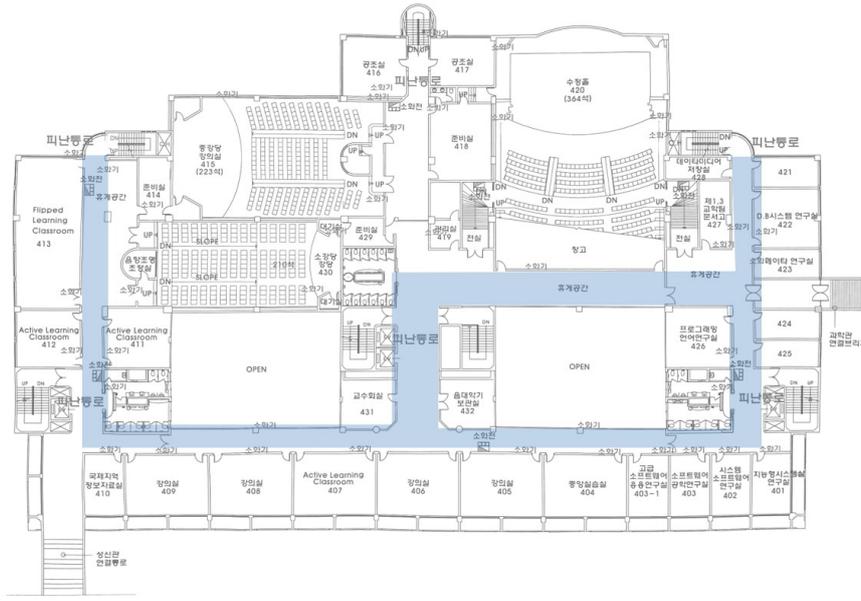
The floor plan of the target building with the accessible track highlighted in color.
